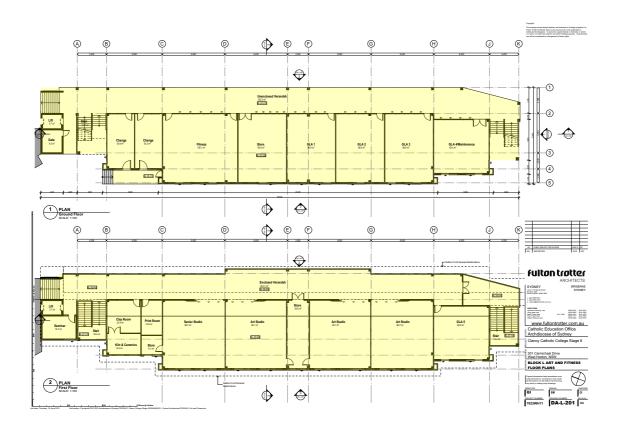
Plan of proposed development – Visual Arts / Fitness building (Ground and First Floor)
